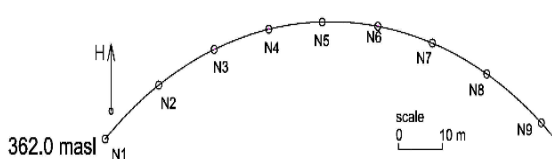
Survey points at elevation 362.0 masl at St. Petka dam.
